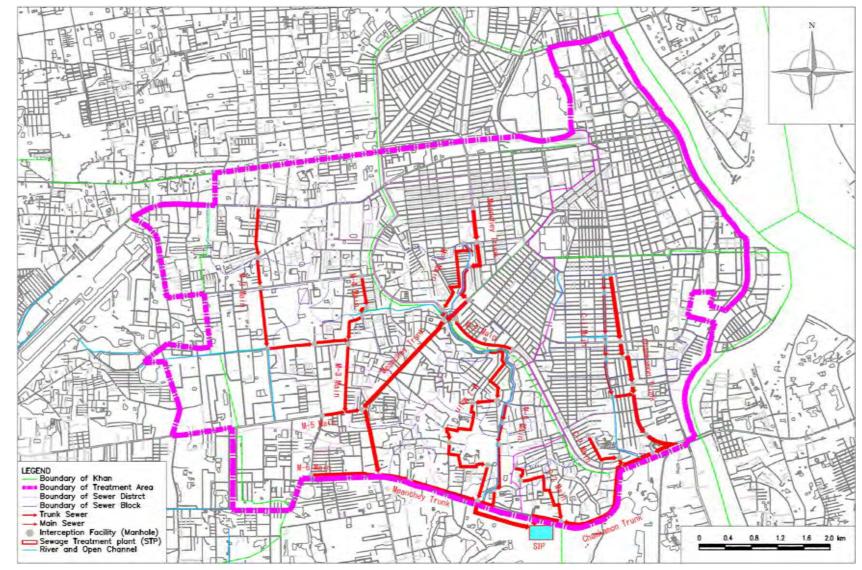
Sewer Network Plan in Cheung Aek Treatment Area
